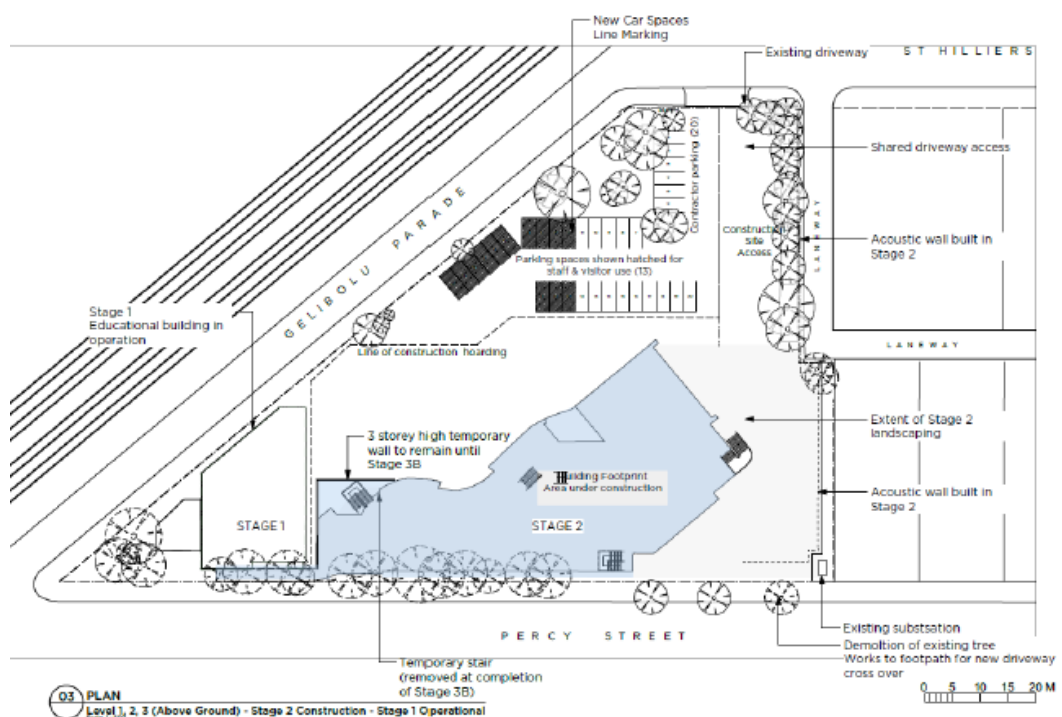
Stage 2 construction works plan – construction of permanent primary school building
